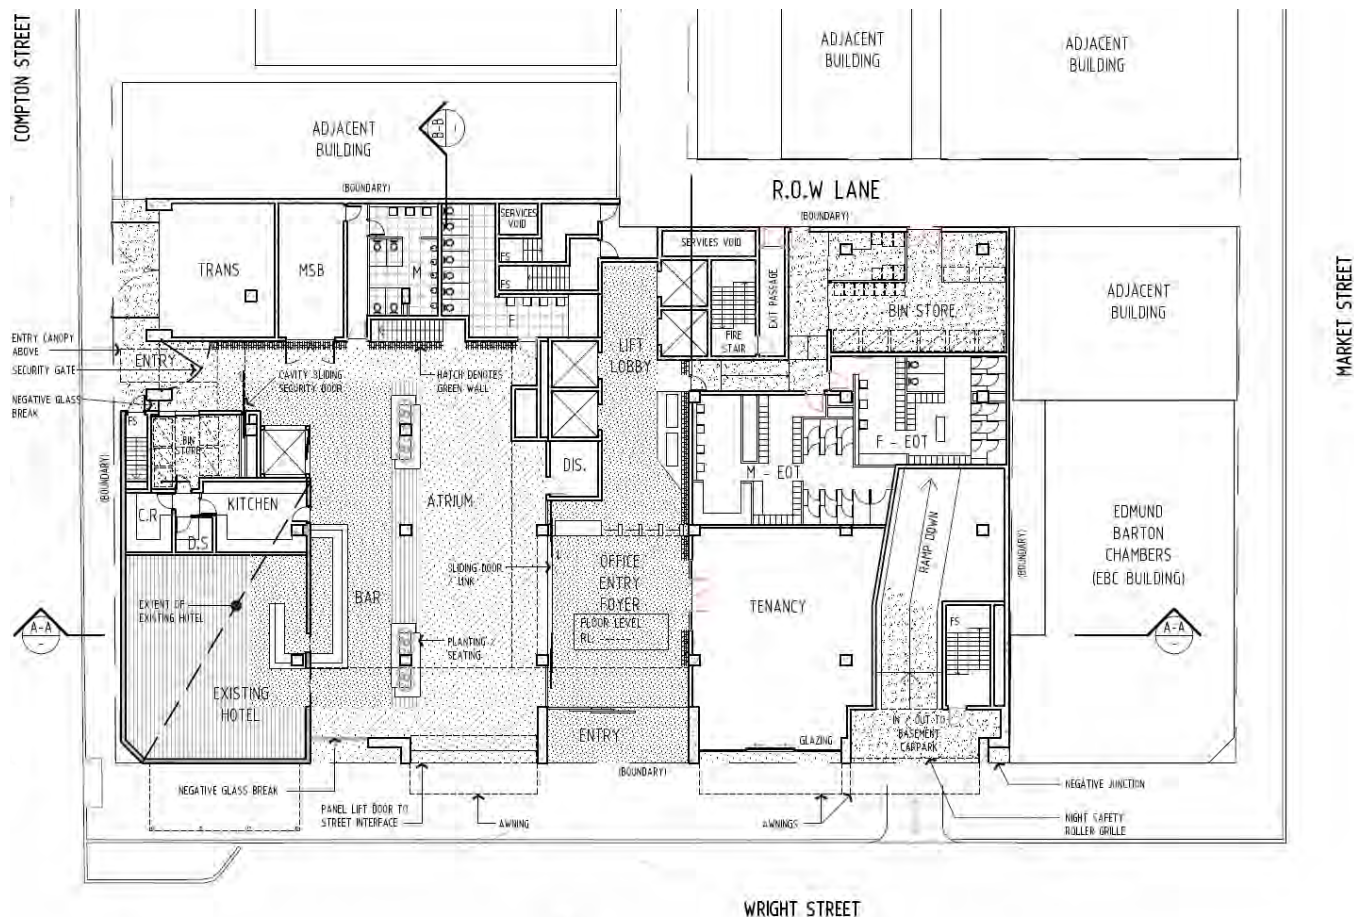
Ground-level plan for proposed multi-storey development at 76-88 Wright St; from plan (Ref: Desktop Review, Ground Level Plan, dated 05/07/17) provided by Project Architect
